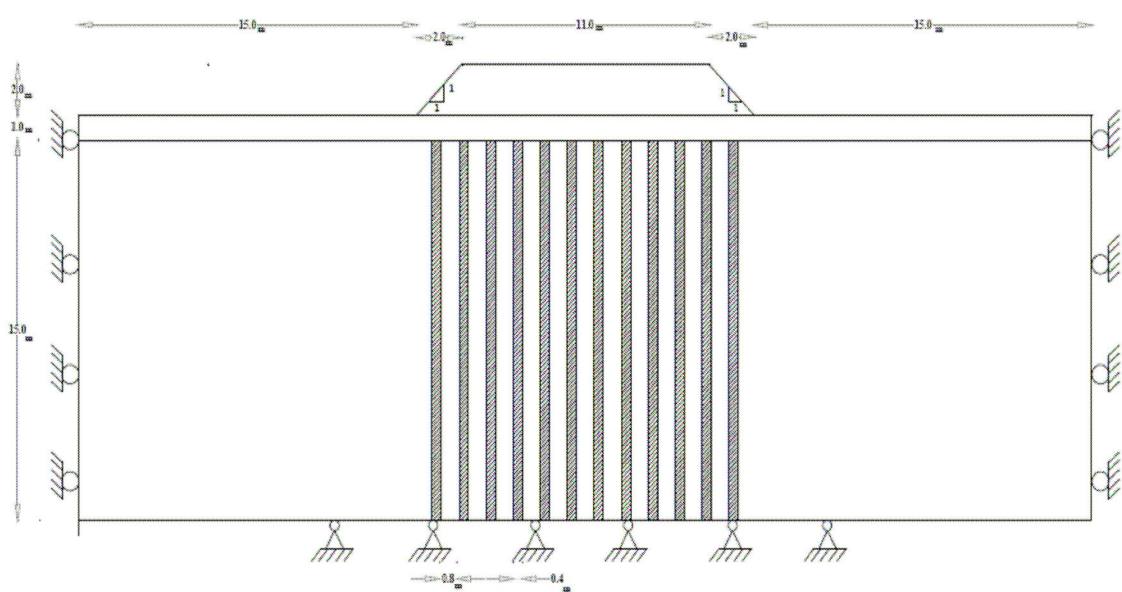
Embankment Cross-Section and Boundary Conditions
